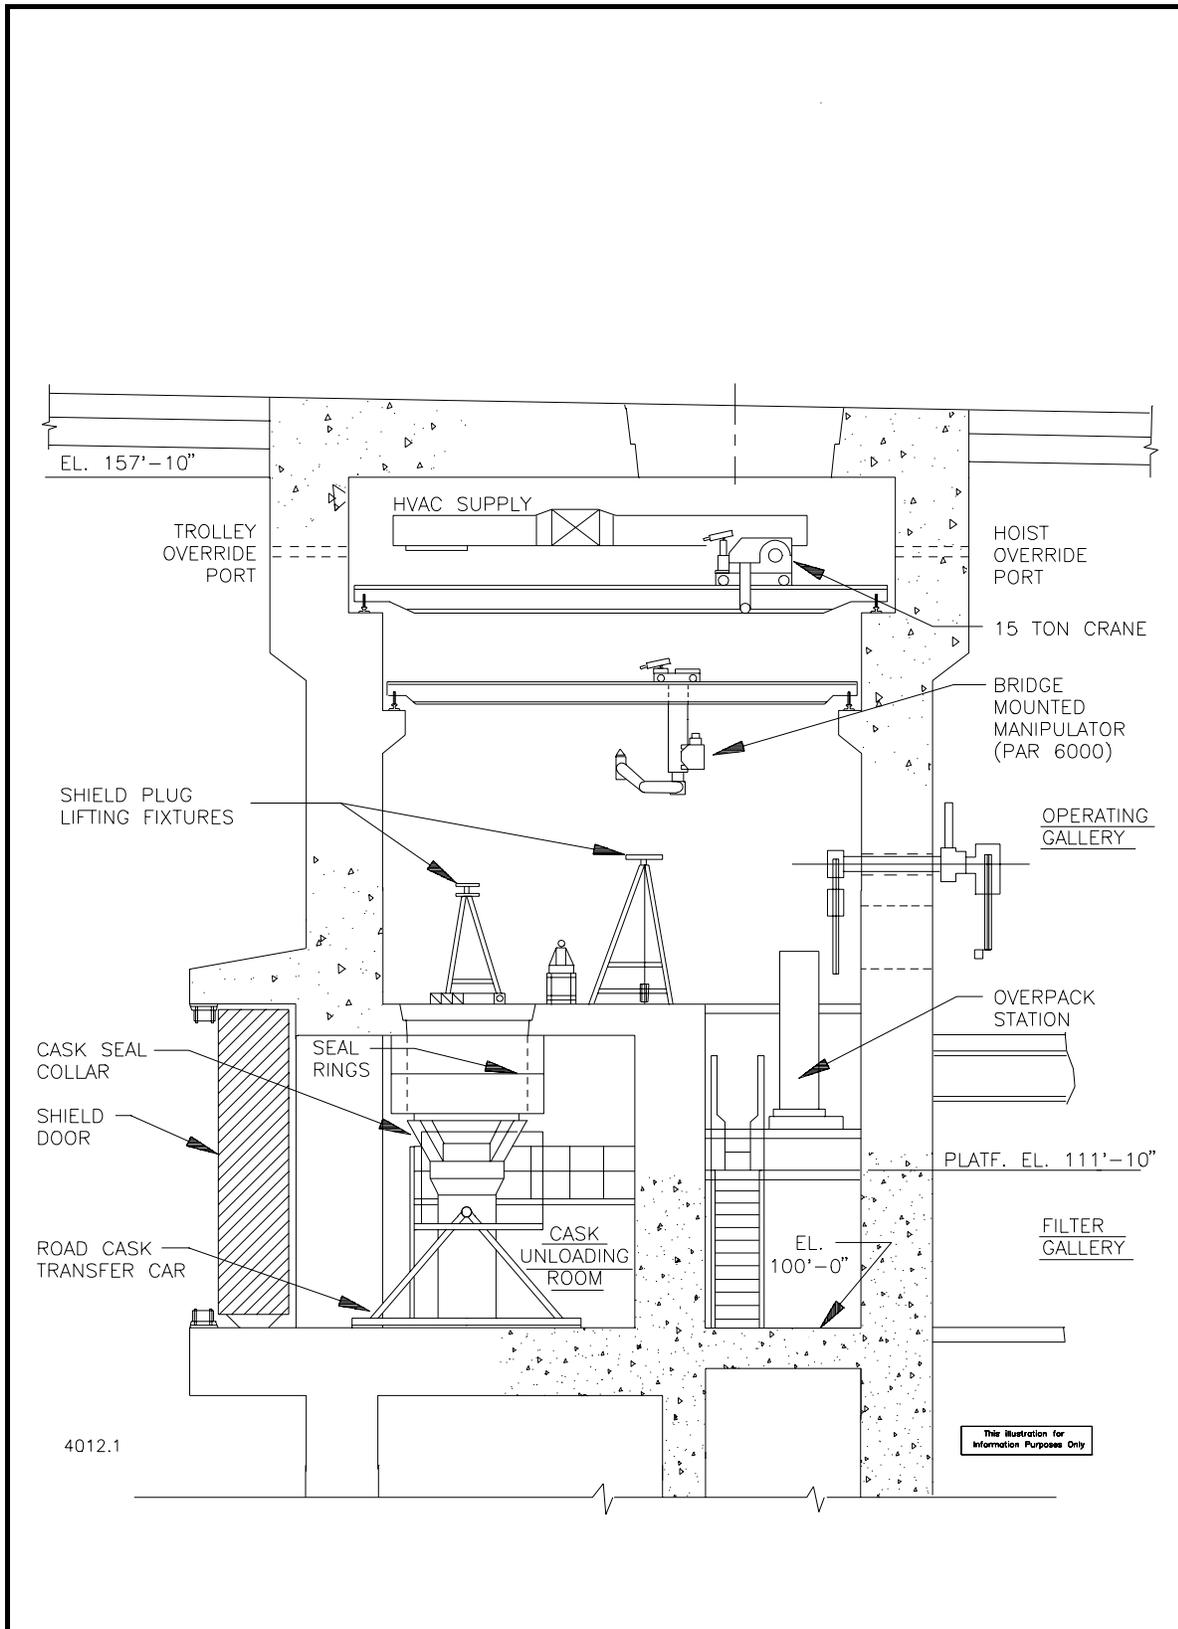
, Details of Hot Cell Cross Section at E-E
